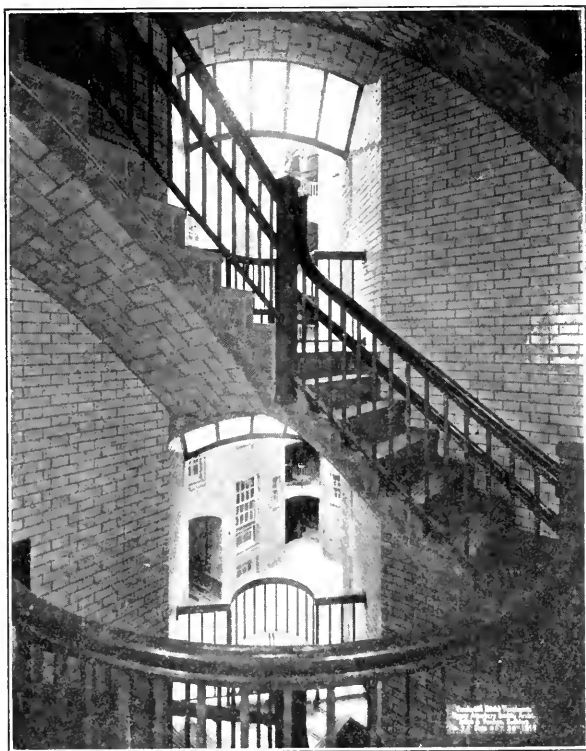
THE OPEN STAIRS, with outlook beyond, across the central court and into the stair well of the opposite corner.
